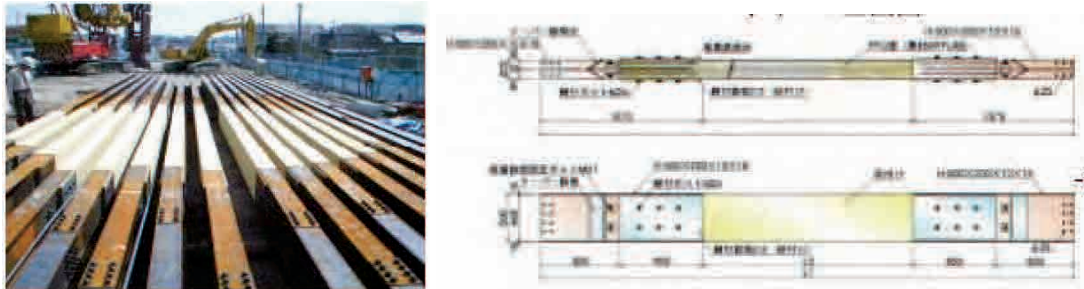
Connection of FFU and H Steel Beam (Core pile for Soil-cement D-Wall)
